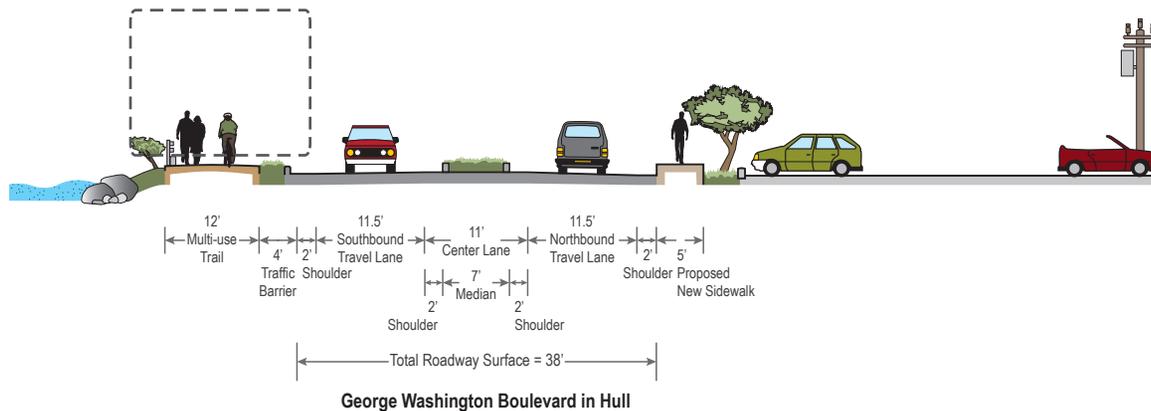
Proposed Roadway Cross-Sections: Multi-Use Trail Alternative,
